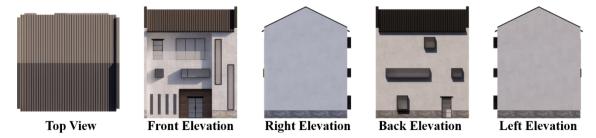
The Top View and Four Elevations of Sample Building No. 2 (Drawn by the author)
